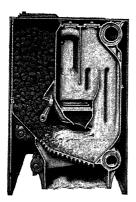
SECTION OF MAGAZINE BOILER (Ideal Boilers and Radiators, Ltd.)
